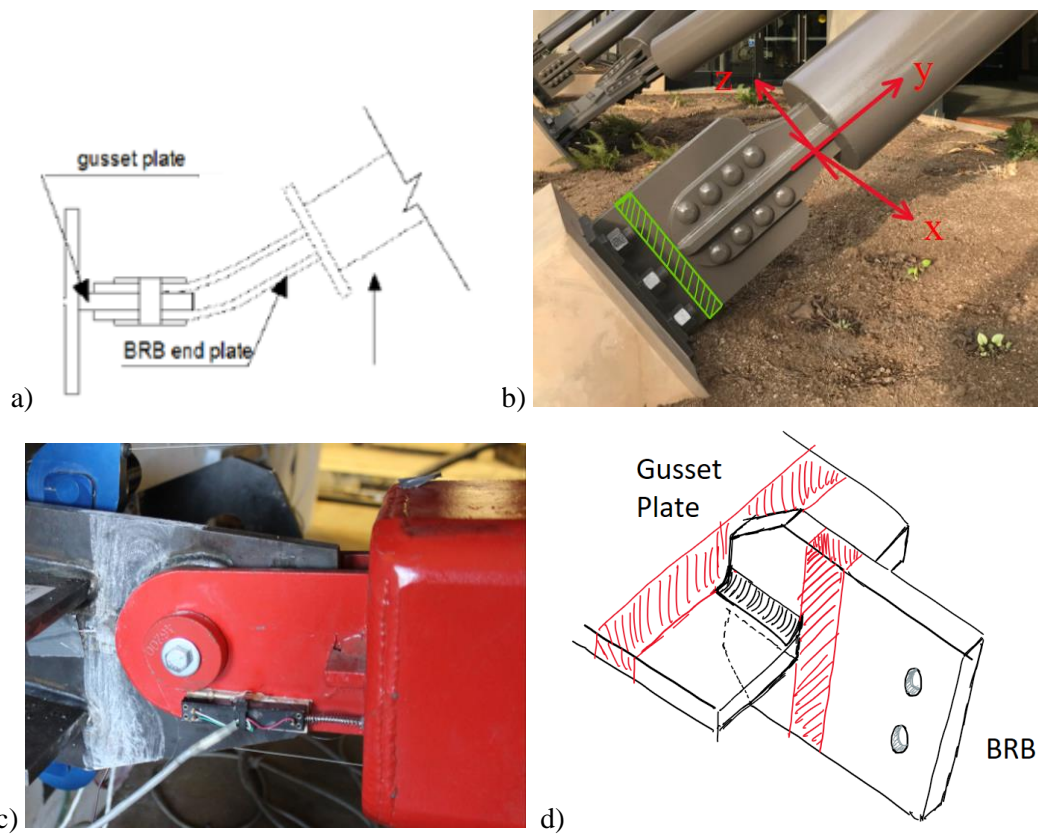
BRB-to-girder connections: a) with flexure in end plates (Wei and Bruneau 2016), b) with bolted connection (CoreBrace 2020), c) with bolted connection (CoreBrace 2020), and d) universal connection
